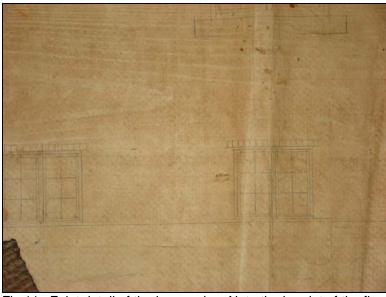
Faint detail of the house plan. Note the imprint of the floorboards on the paper.
